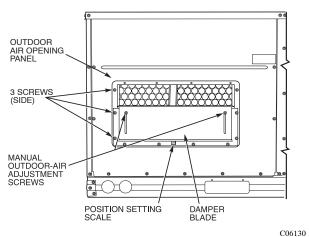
Damper Panel with Manual Outdoor-Air Damper Installed
